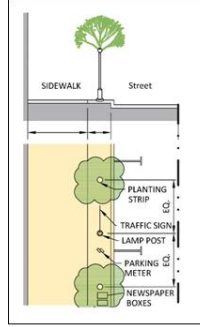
Street Trees on TOD, Pedestrian and Connector Street
